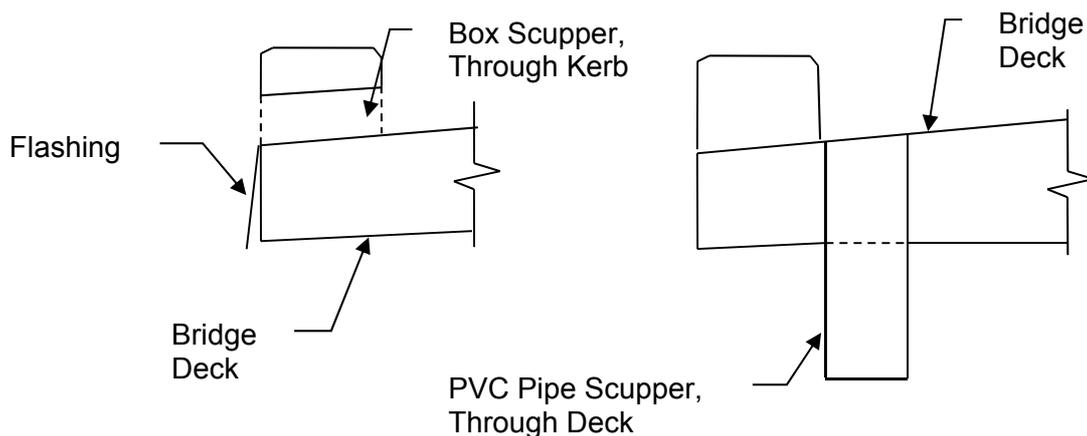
TYPICAL SCUPPER AND FLASHING
